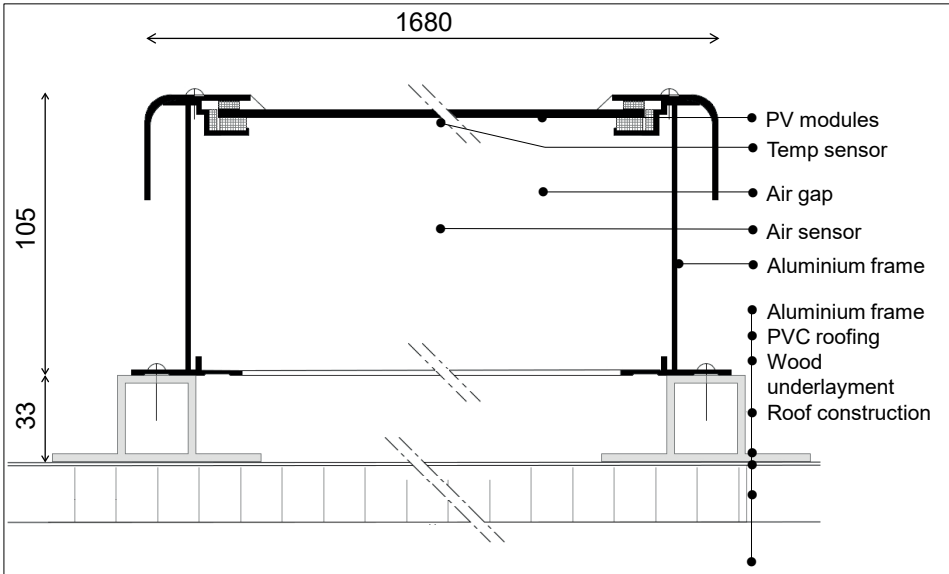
Technical horizontal section of the BIPV rooftop design. In the non-ventilated segment, the top and bottom opening has been sealed. All sizes in mm.
